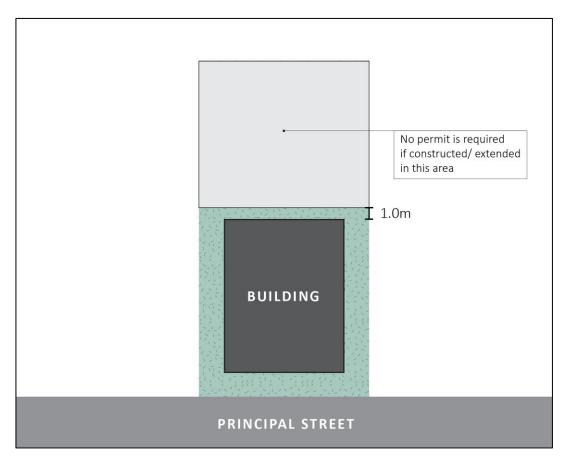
Construction or extension of an outbuilding is exempt if located in this area
